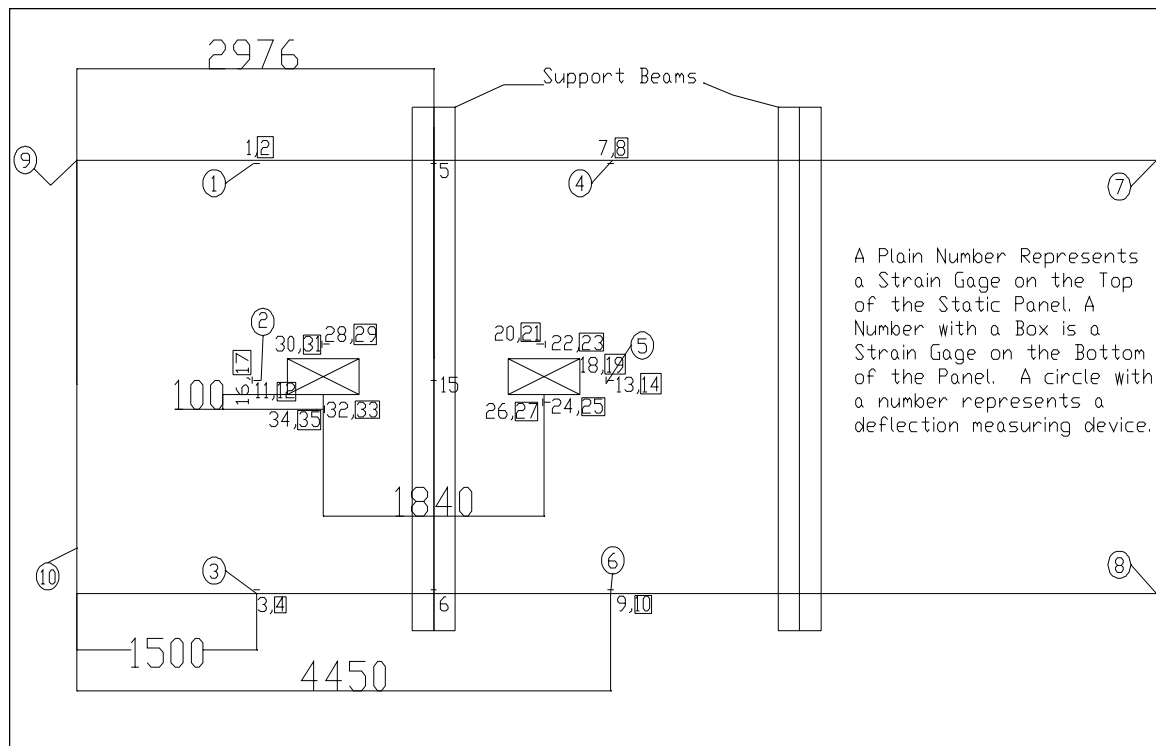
LOAD POSITIONS AND INSTRUMENTATION FOR STATIC TEST E1-A
